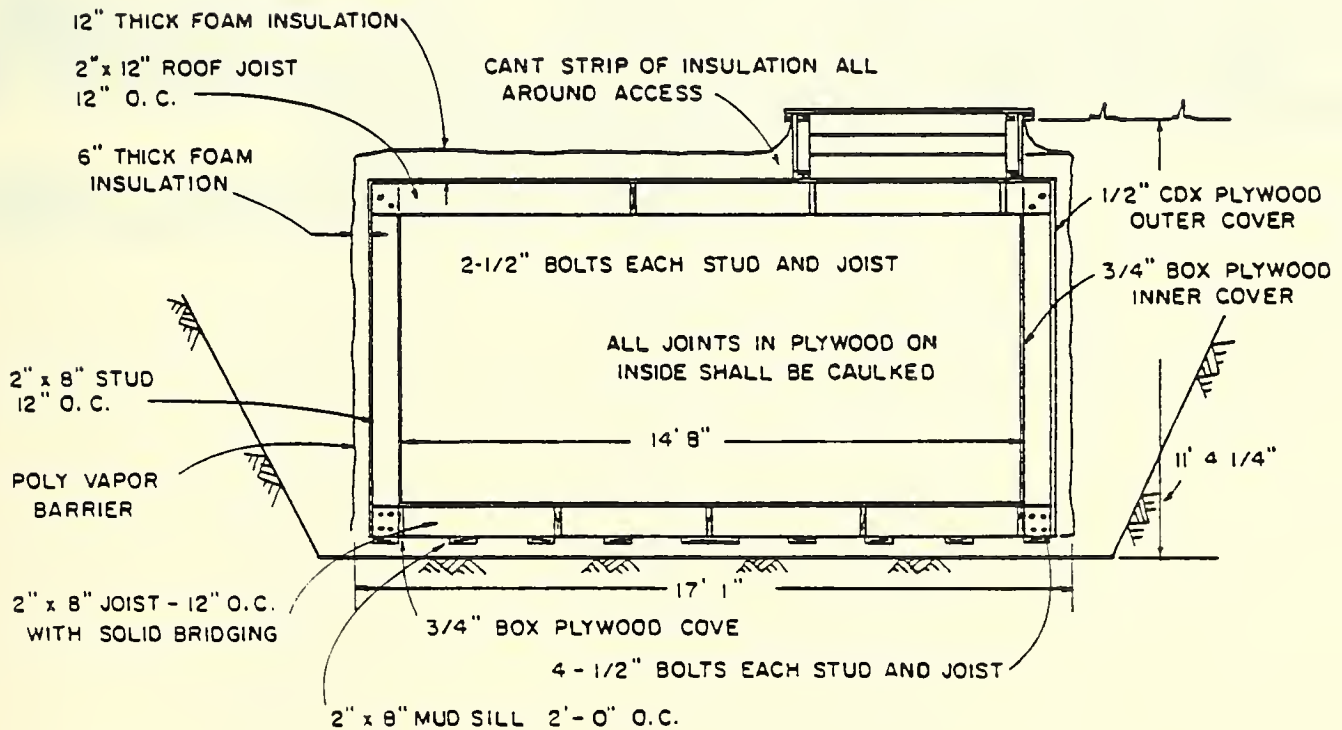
Section of House. Fig. 69. Section of Wall.
